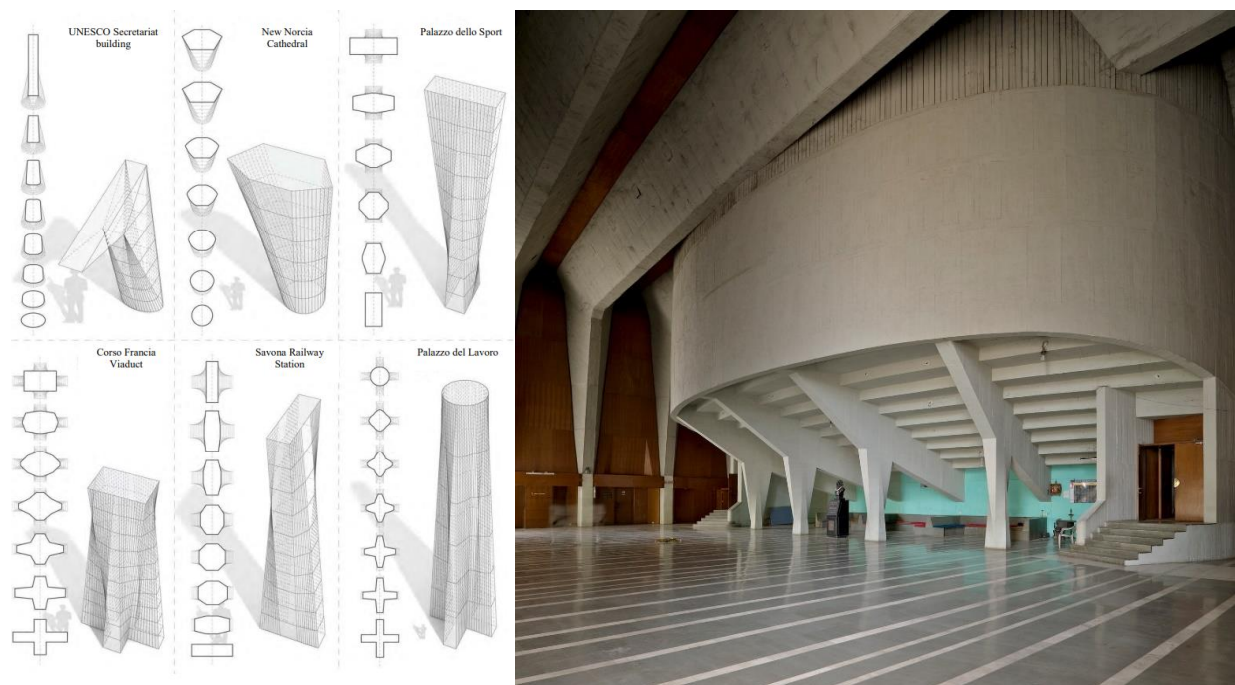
Images of shaped and twisted columns that respond to loading demands by Pier Luigi Nervi (left) and shaped column and folded plate structural system of Tagore Hall by Mahendra Raj (right)
